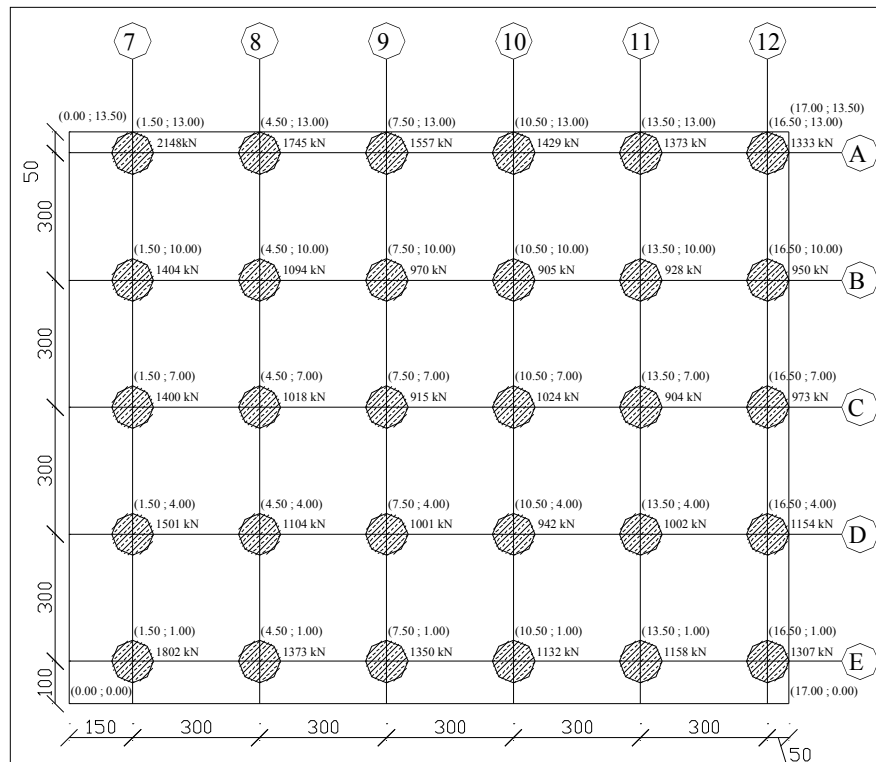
Pile disposition plan and pile loads (30 piles with 25m length)
